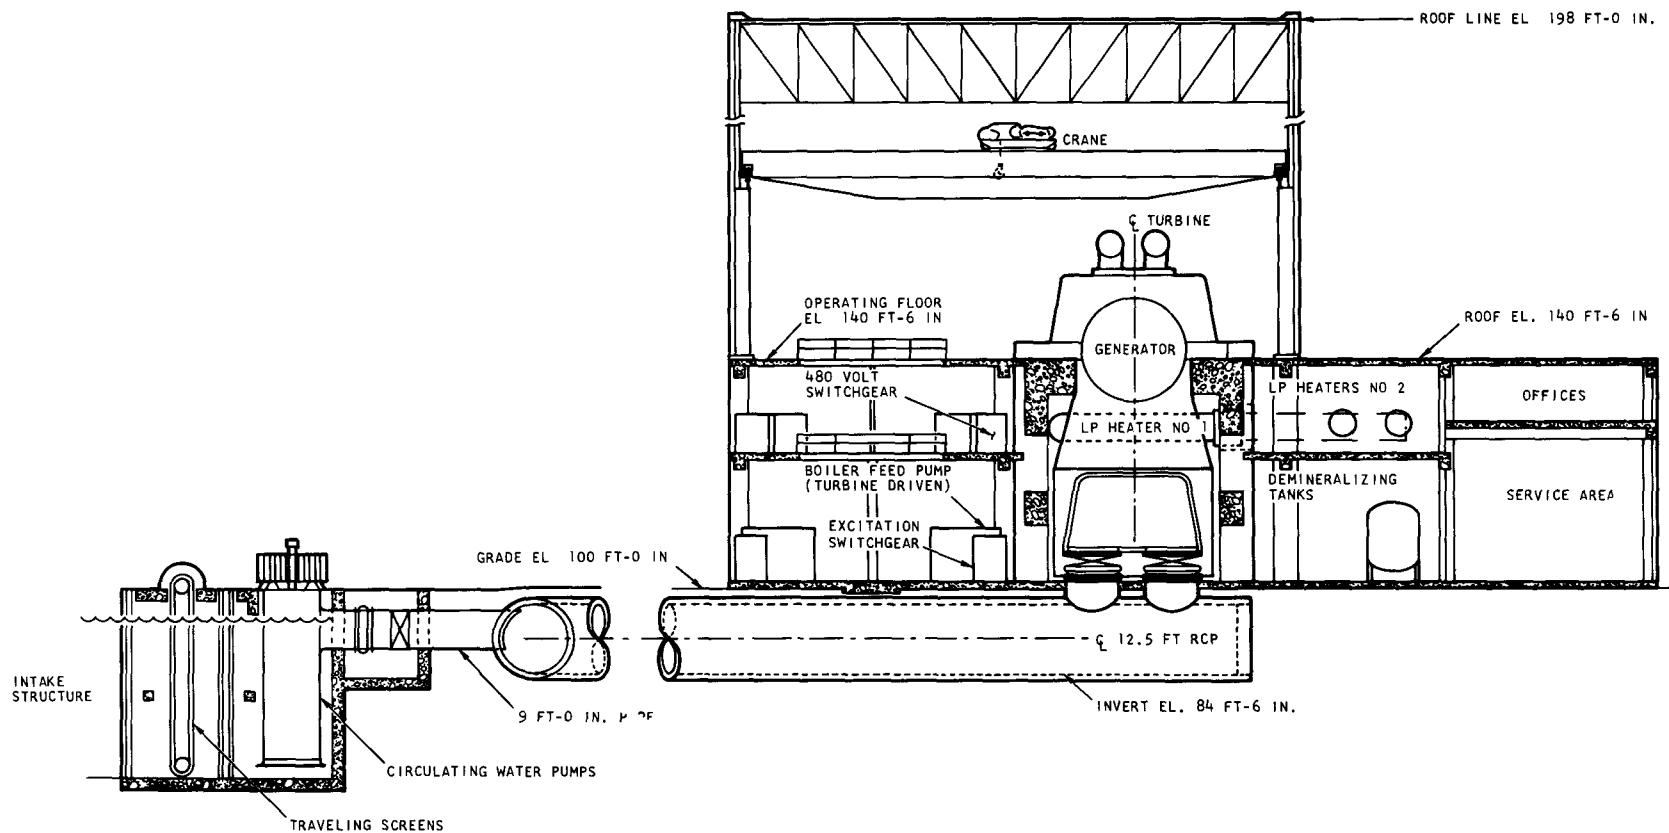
Turbine Plant Arrangement, Section. (GGA illustration)
